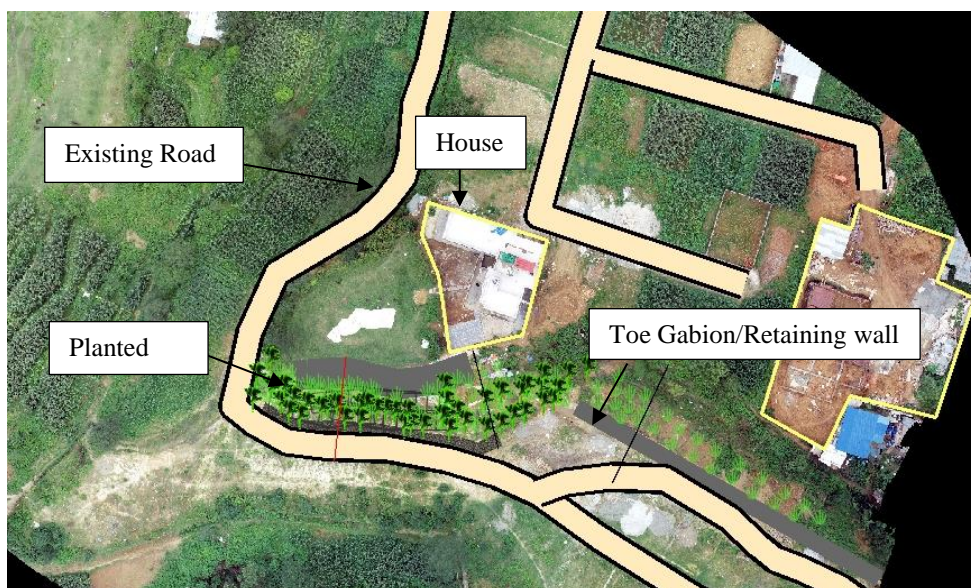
The Digital-photo of the study area shows Newly plan constructed to mitigate the hazard
